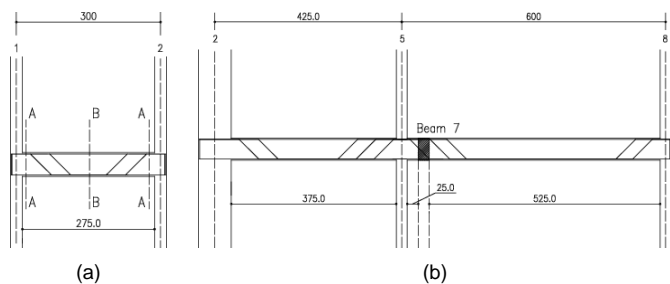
Geometrical and reinforcement characteristics of (a) beam 5 and (b) beam 2 as defined in Fig. 1
